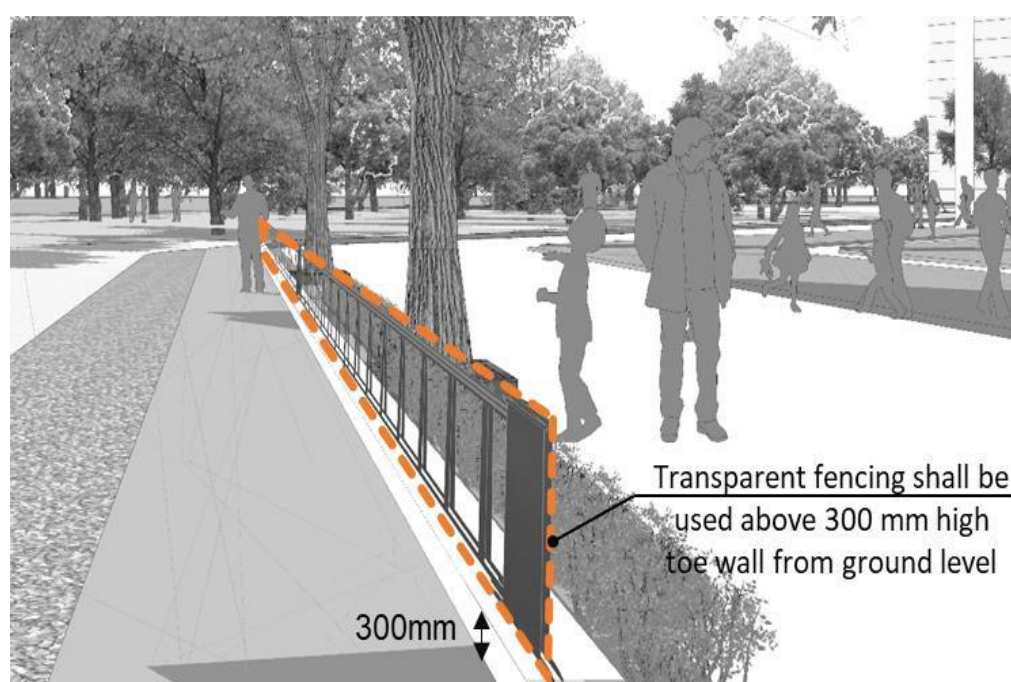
INDICATIVE DIAGRAM OF OPEN SPACES AROUND BUILDINGS
